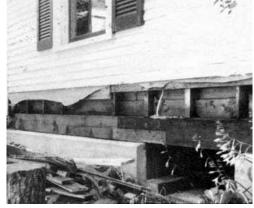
When replacing a section of the sill in a post-and-beam structure, cut matching half-laps in the old and new sections (above). Force the new section into blace with crowbars, sledges, and jacks. When lagged and bolted into place, the half-lap securely ties the new sill section into the old (right).
